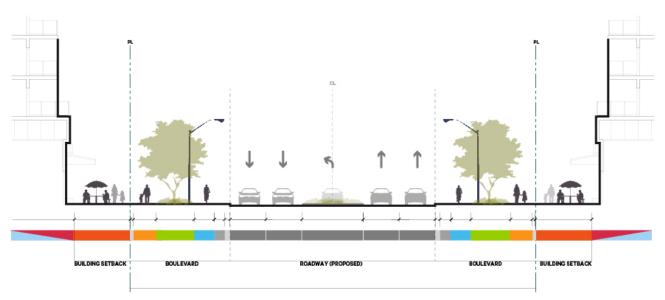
Potential Markham Road Cross-Section Typical Right-of-Way (Subject to Revision)
